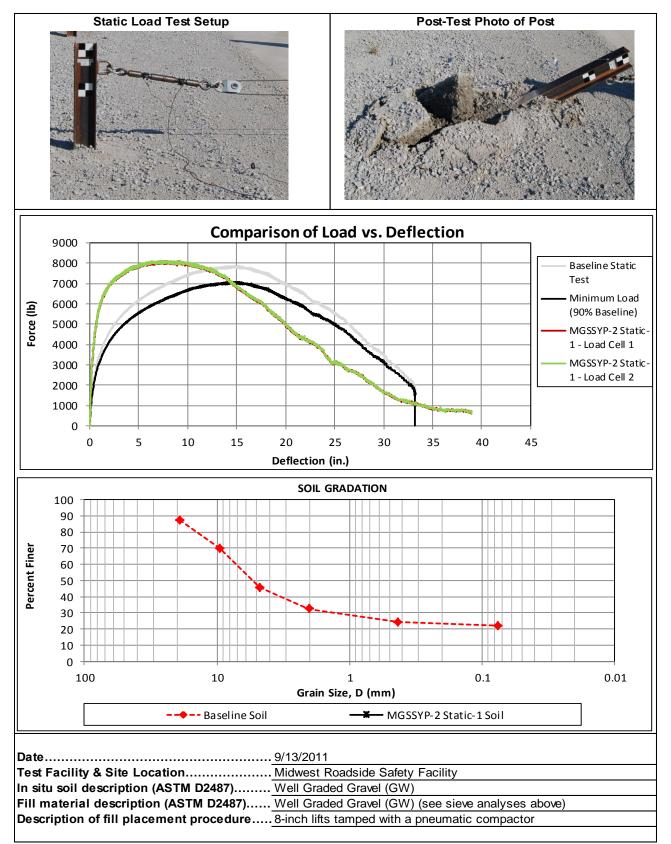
Test Day Static Soil Test, Test No. MGSSYP-2
